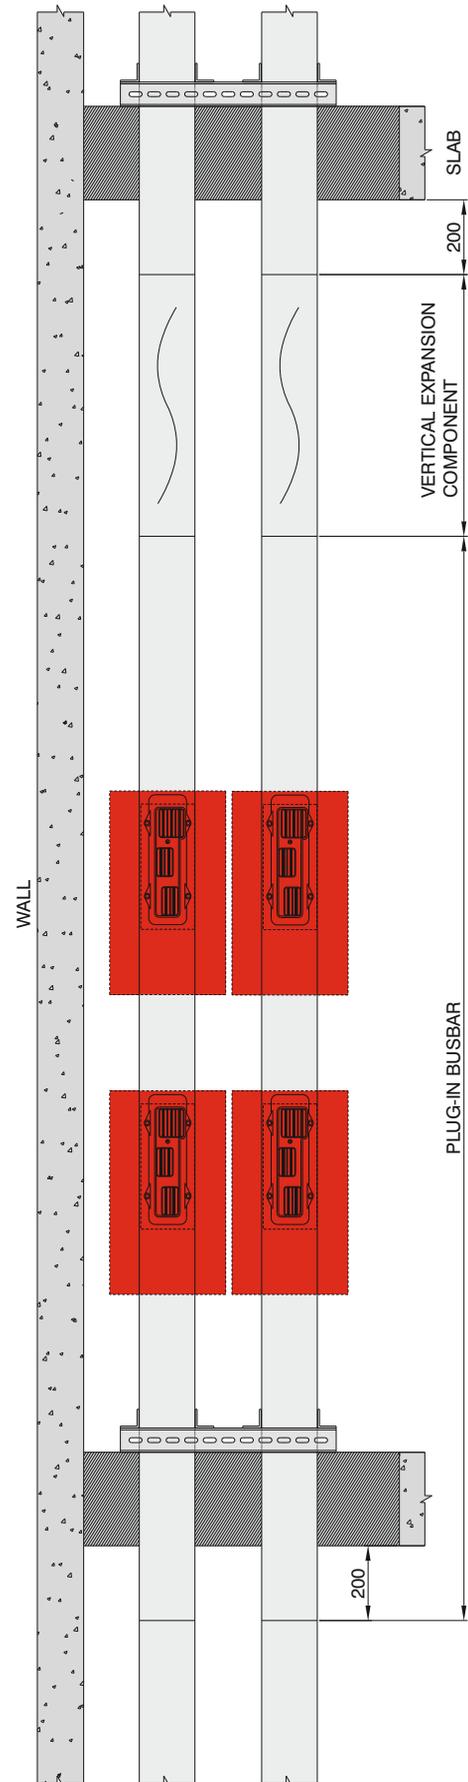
MINIMUM DIMENSIONS BETWEEN 2 RISERS
